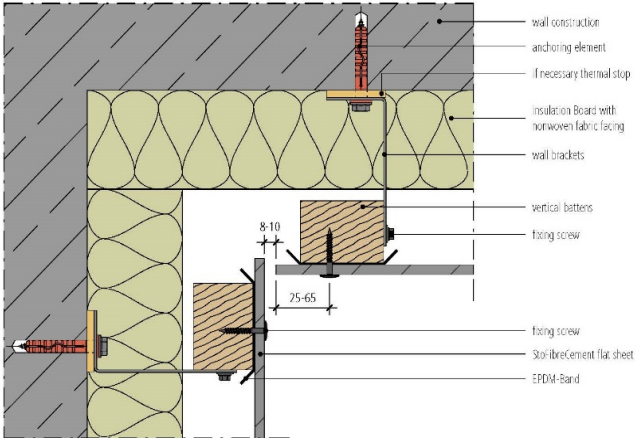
WALL BRACKET/TIMBER BATTENS
